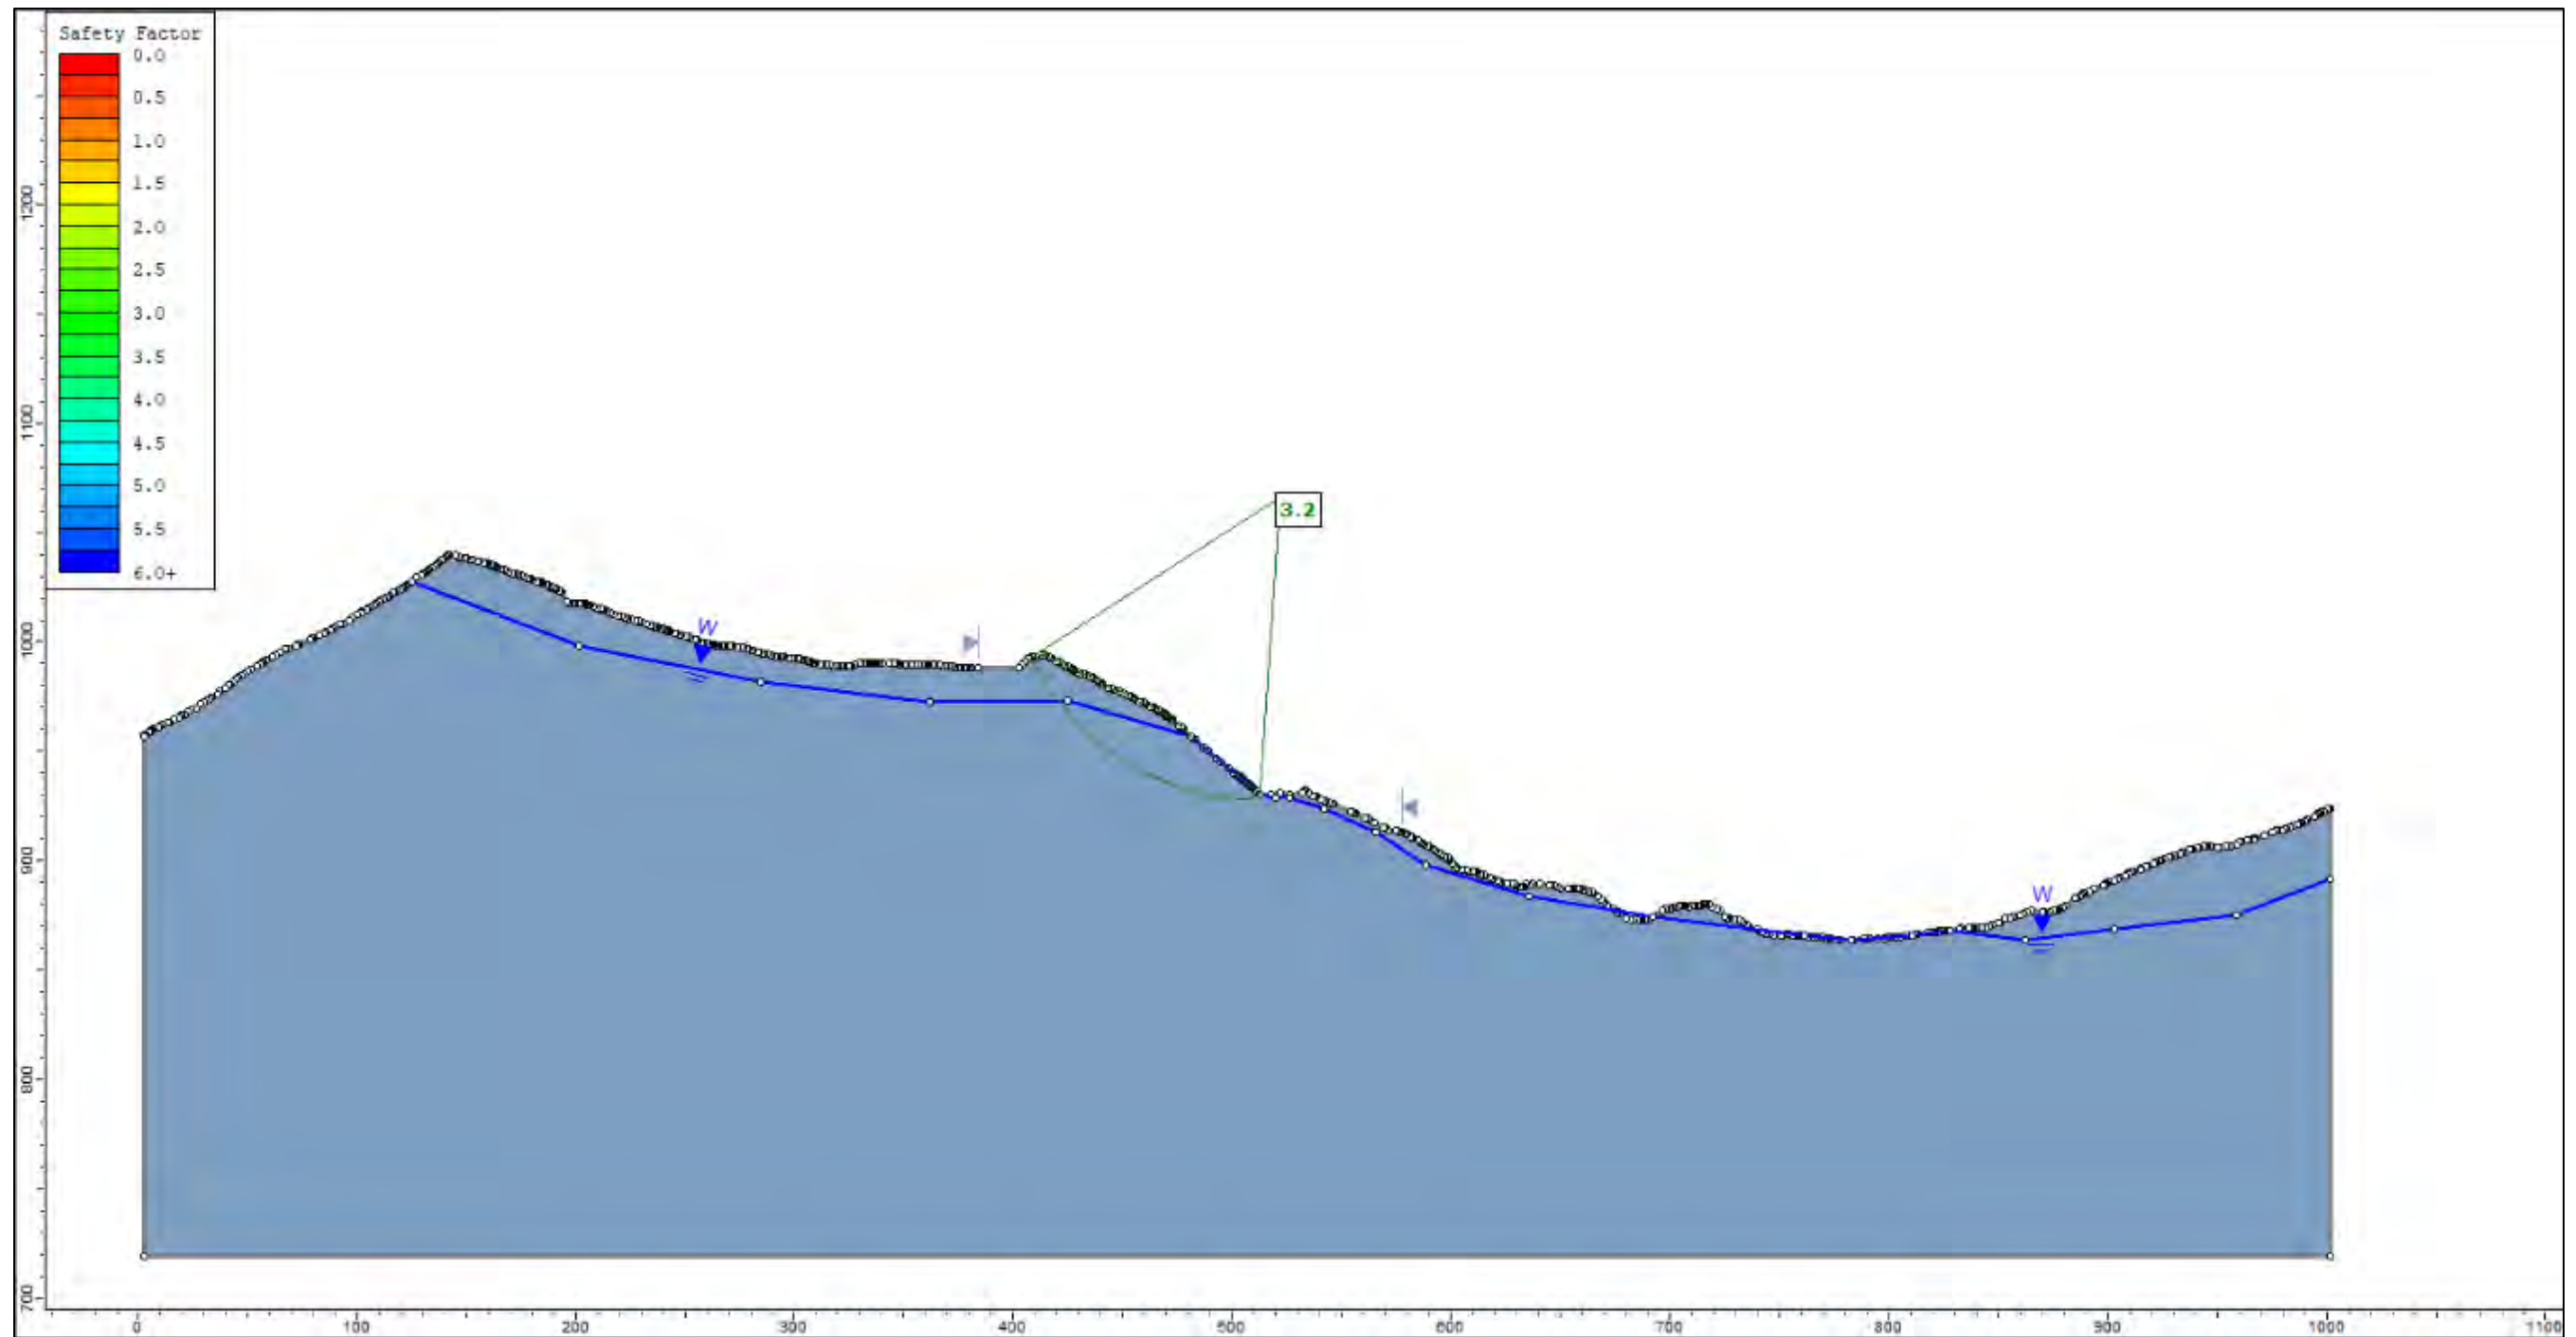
Haul Road Cut - Section 108 – Elevated Groundwater Conditions.
